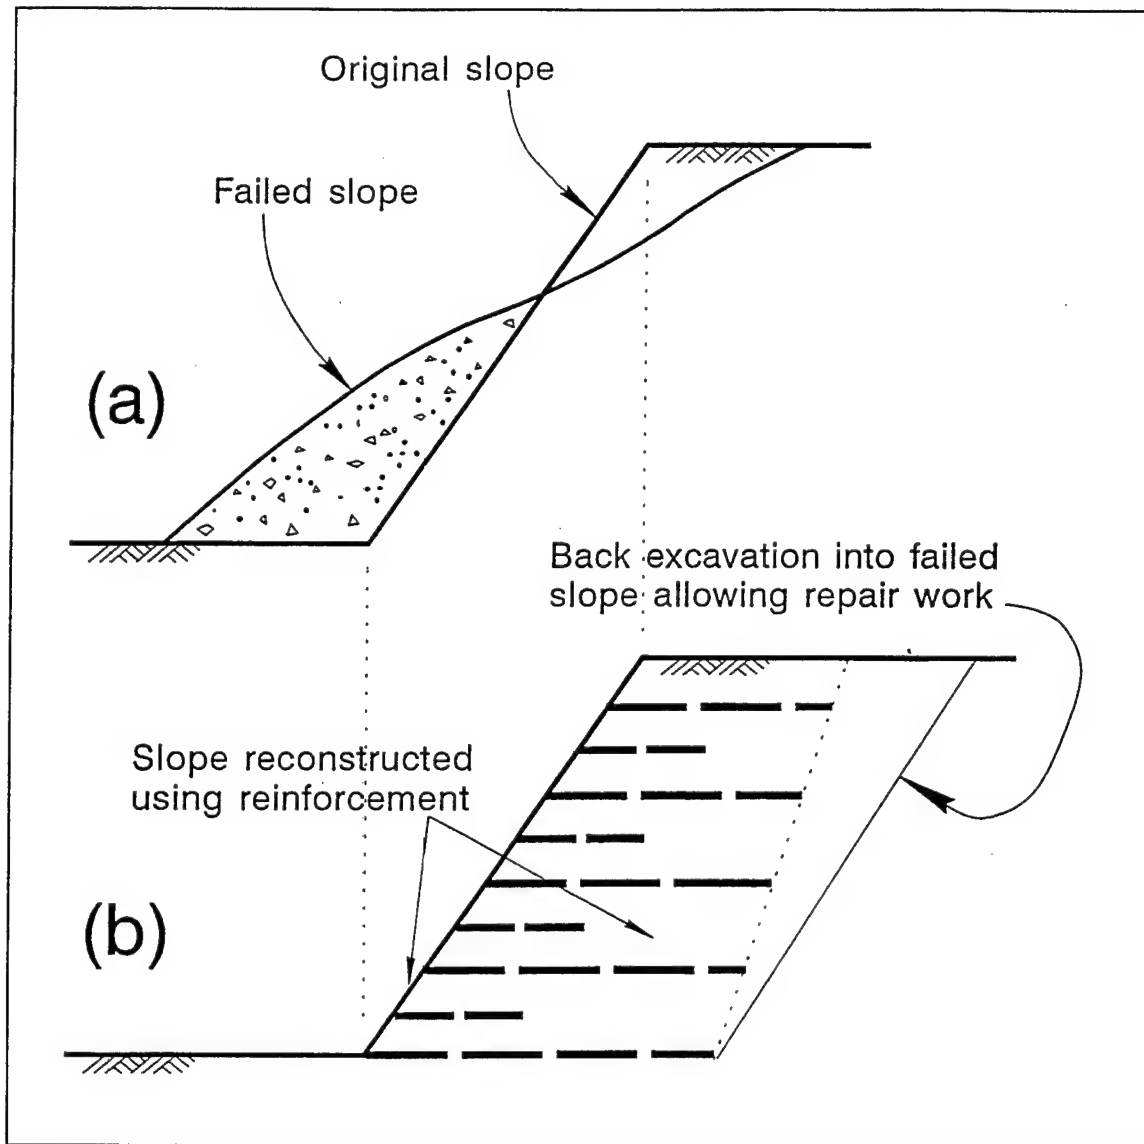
Slope repair (a) Failed section, and (b) Reconstructed slope (may be steeper than, or same as, original grade)
